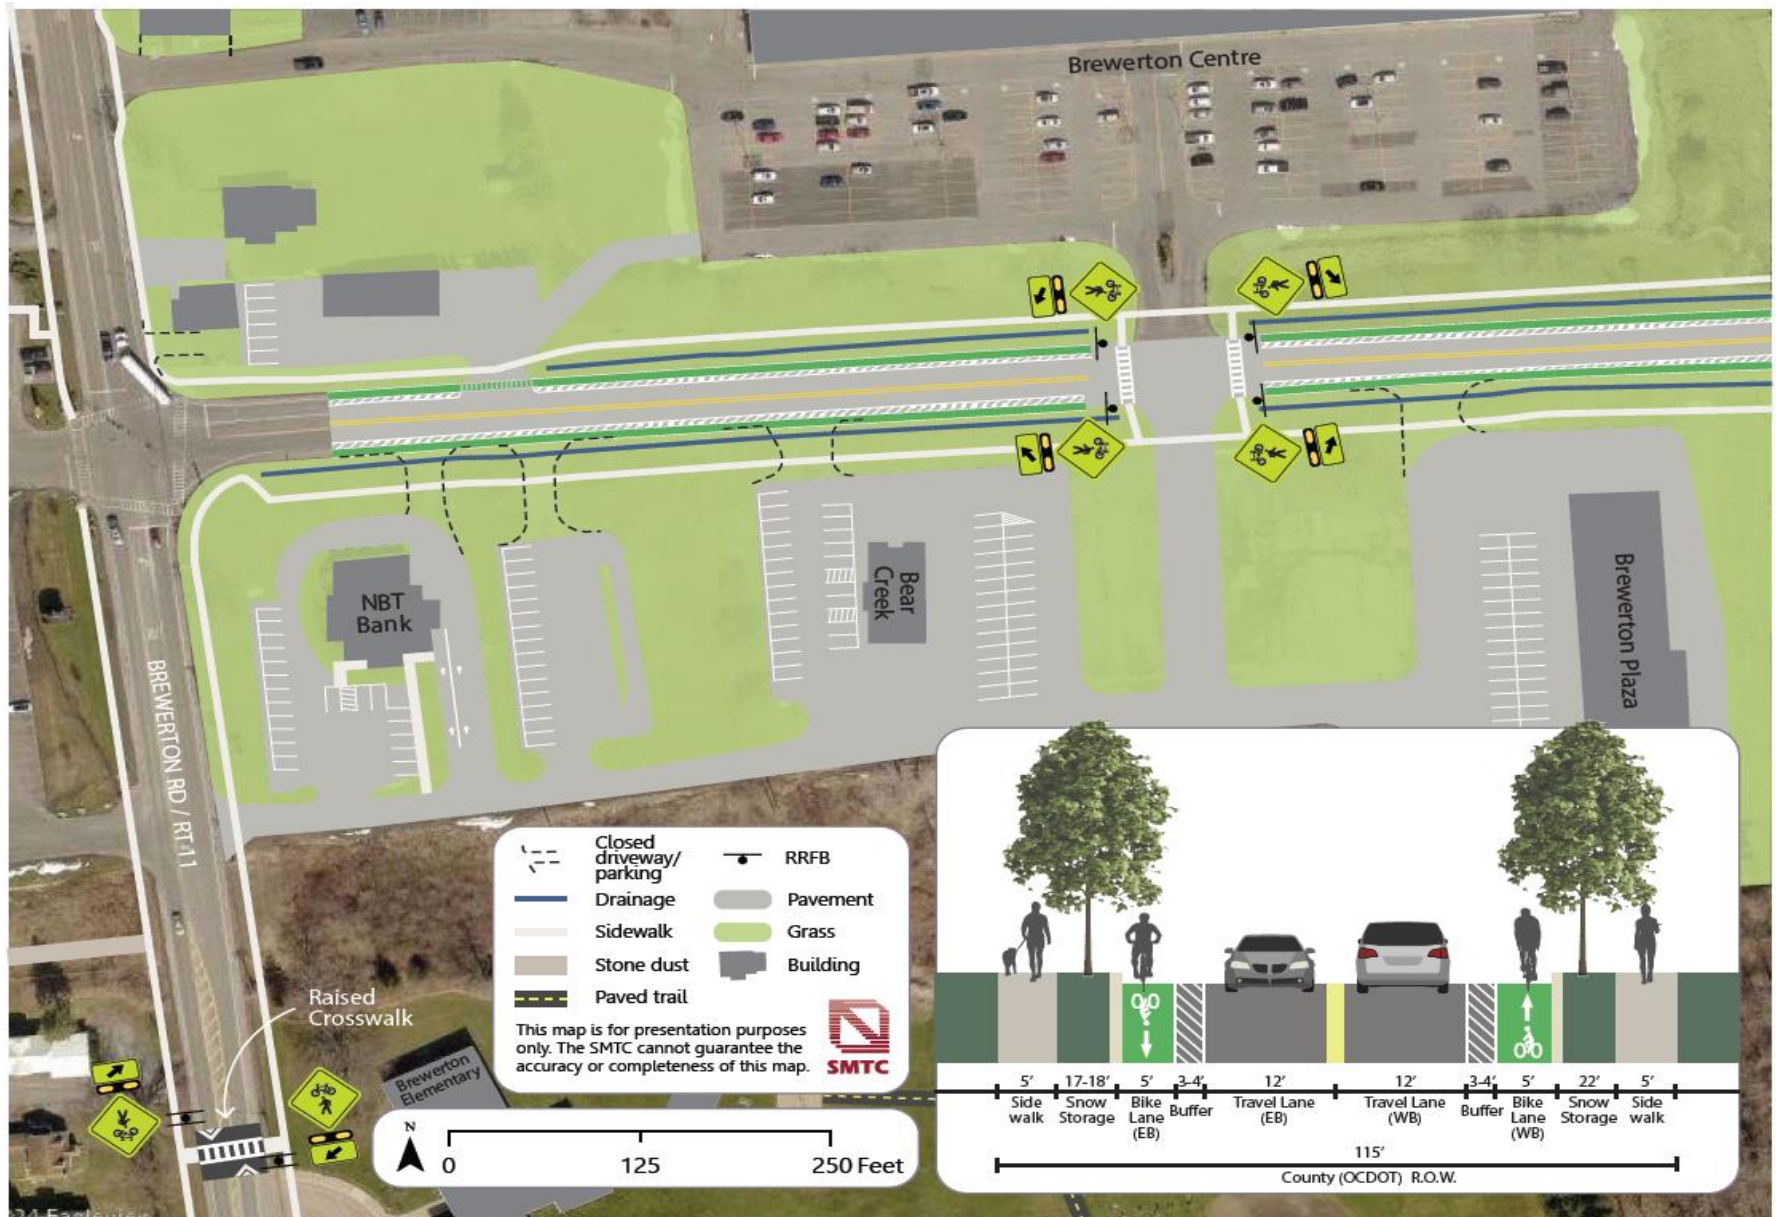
Envisioned Conditions: Bartell Road (Route 11 to Neva Lane)
